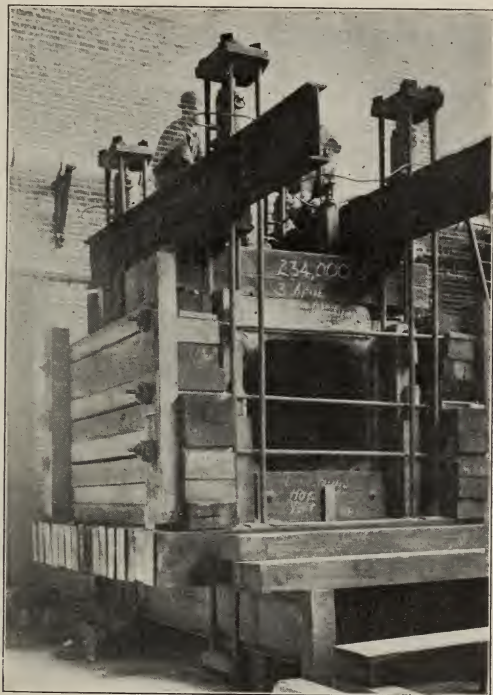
VIEW OF HYDRAULIC JACK TESTING MACHINE.
